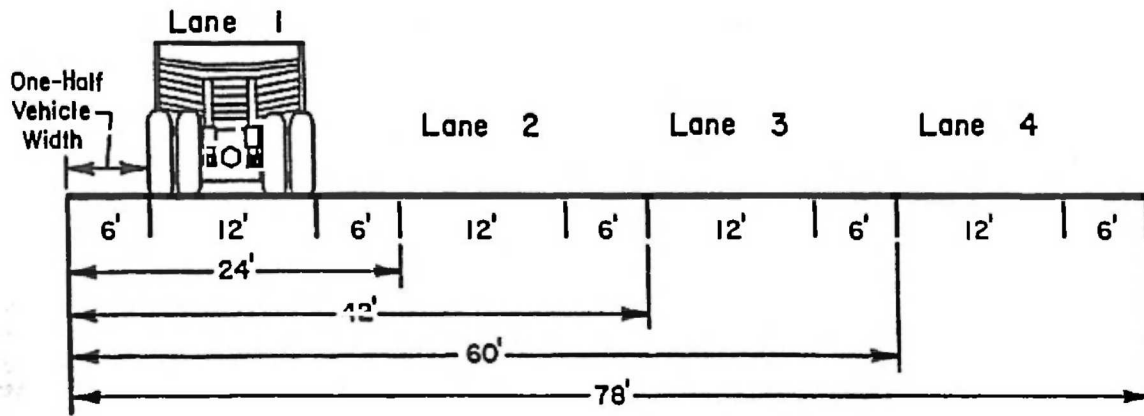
Multi-lane road design widths (Kaufman & Ault, 1977).
